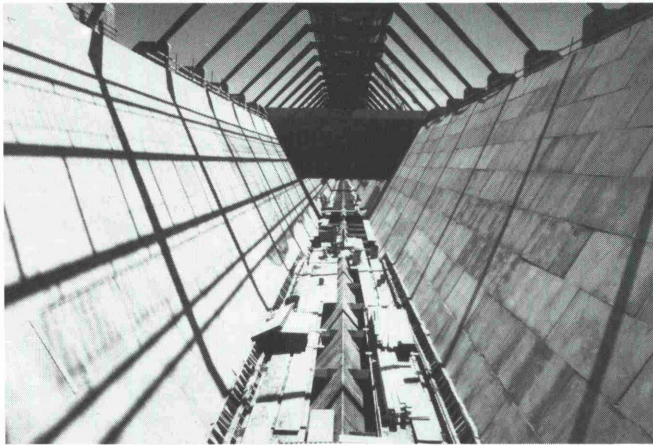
60,000 t slot at Pawnee Power Plant is divided by diaphragm walls into three sections
